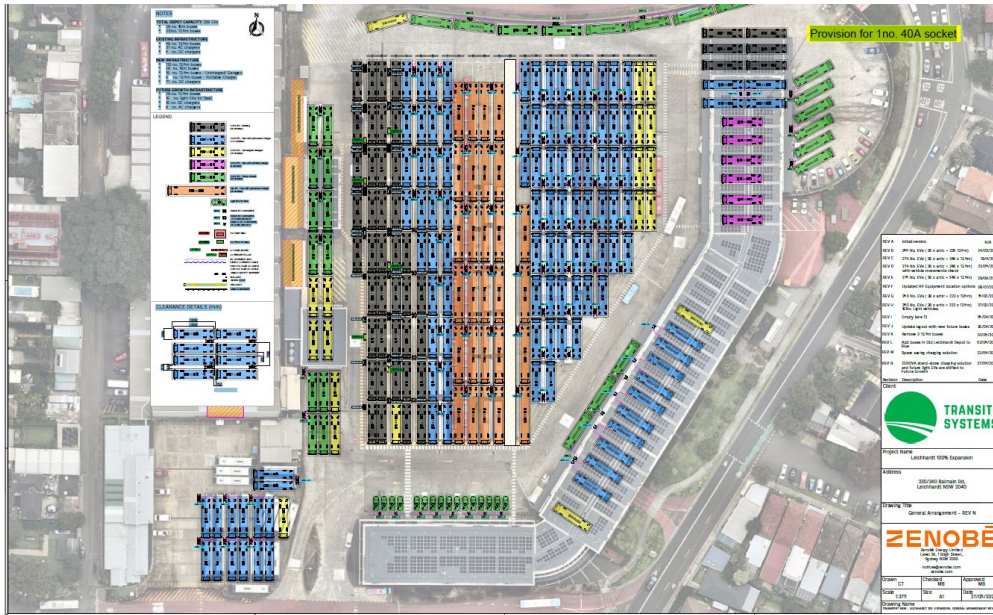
Proposed future layout of the Leichhardt Bus Depot. The layout shows the proposed gantry in the centre of the site, the proposed layout of the new charging array including the areas in the former SRA office and amenities building yard.
